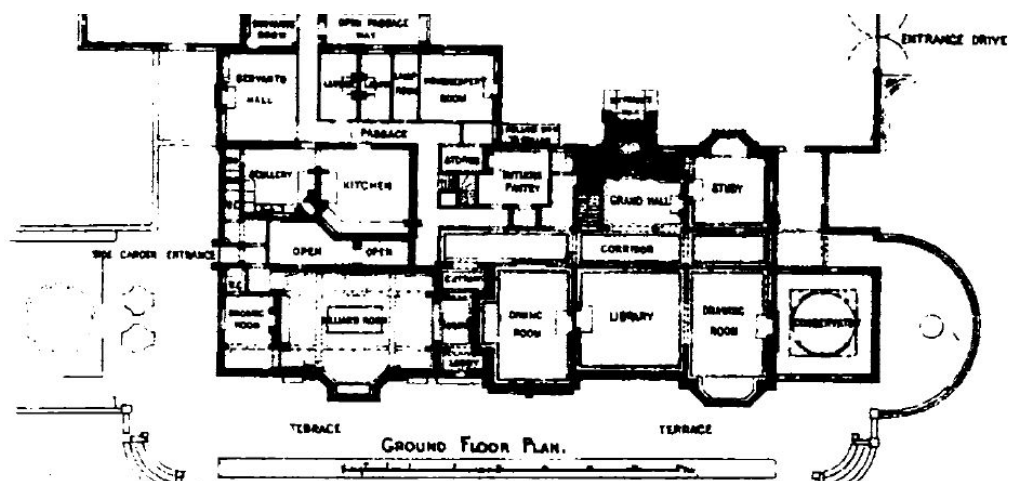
Original ground floor plan from *The Architect*, 1876. Note the completely different arrangement within the entrance hall, then stair, and today's stair hall, then service rooms (shaded).
